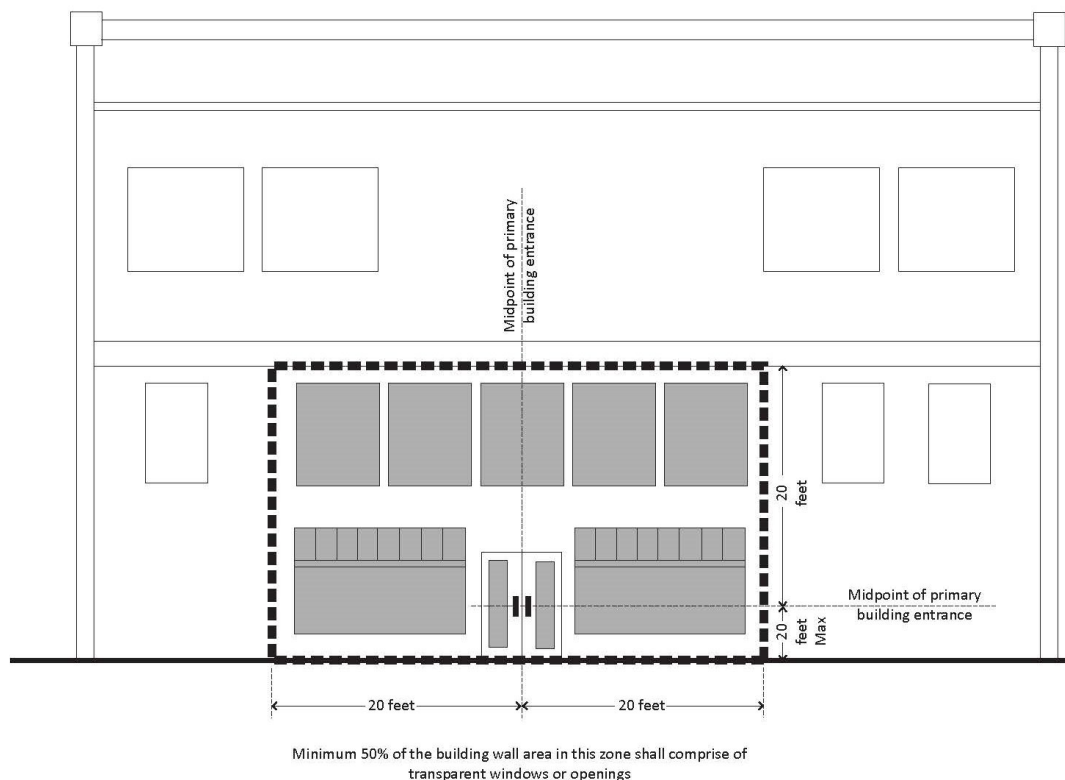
D: ELEVATION FAÇADE TRANSPARENCY AT PRIMARY ENTRANCE
